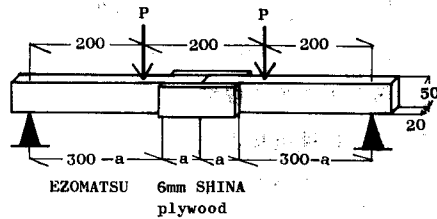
Bending test specimen of plywood gusset. (unit: mm)
